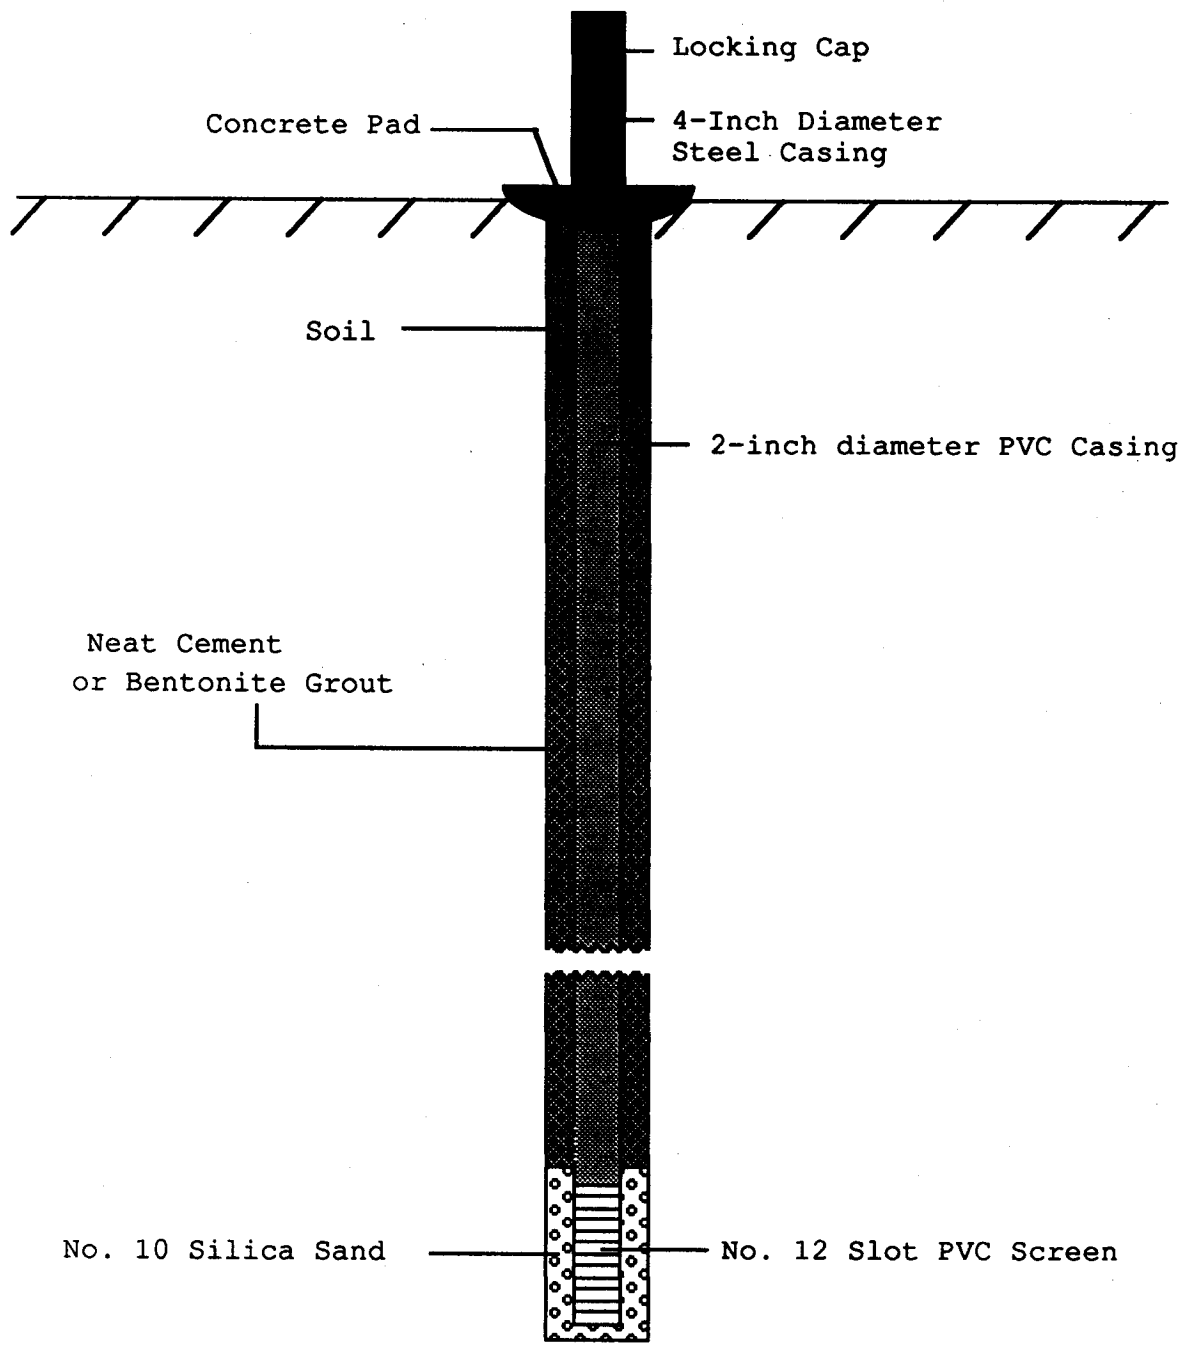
Construction design used for monitoring wells installed at the Beulah landfill.
